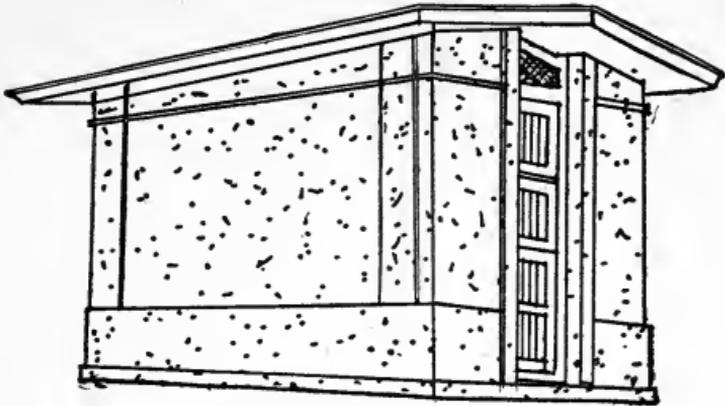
Concrete Farm Ice House with Flat Roof Made of Asphalt
